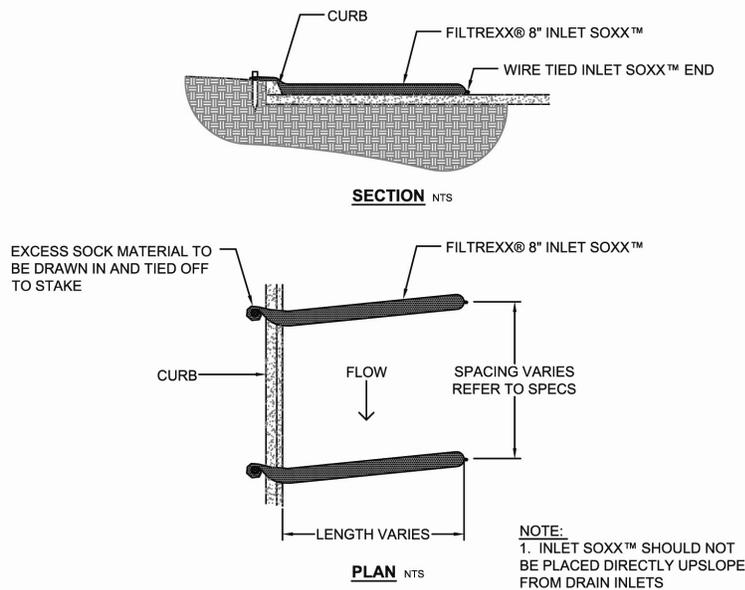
Engineering Design Drawing for Curb Sediment Containment InletSoxx™
